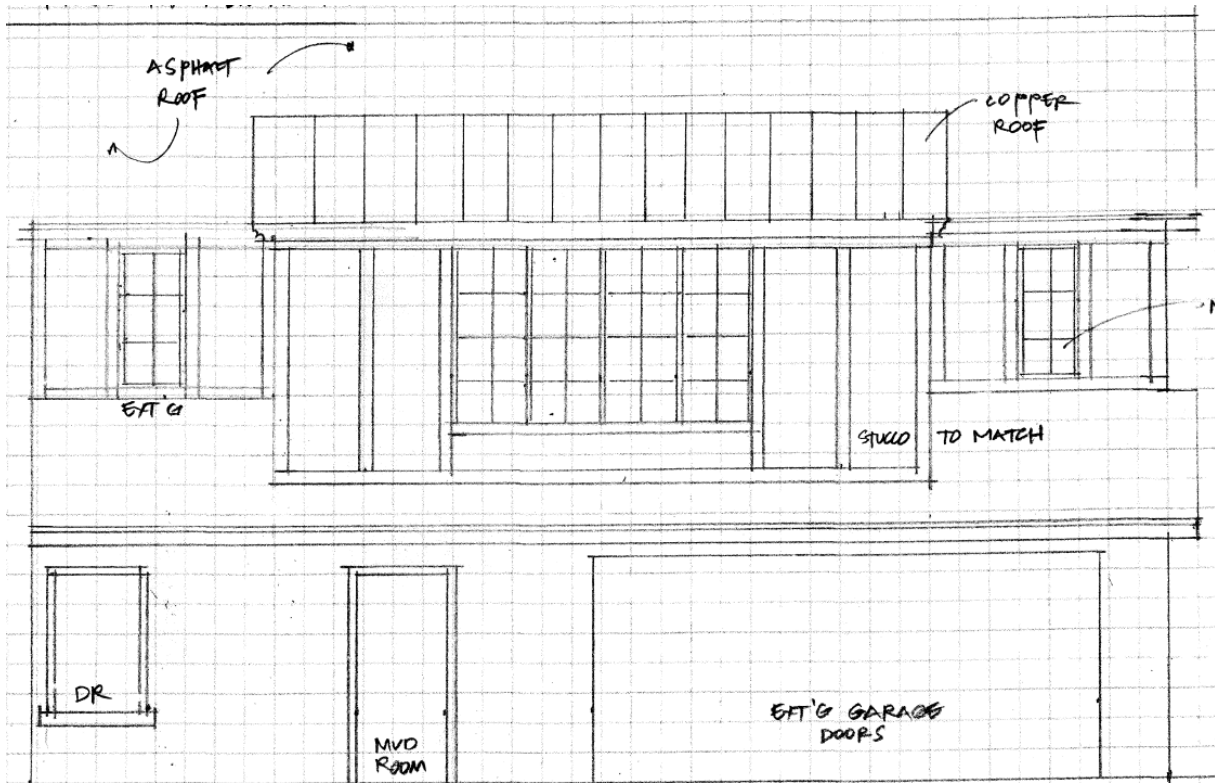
Previous north elevation of proposed second-floor addition (October Meeting)
